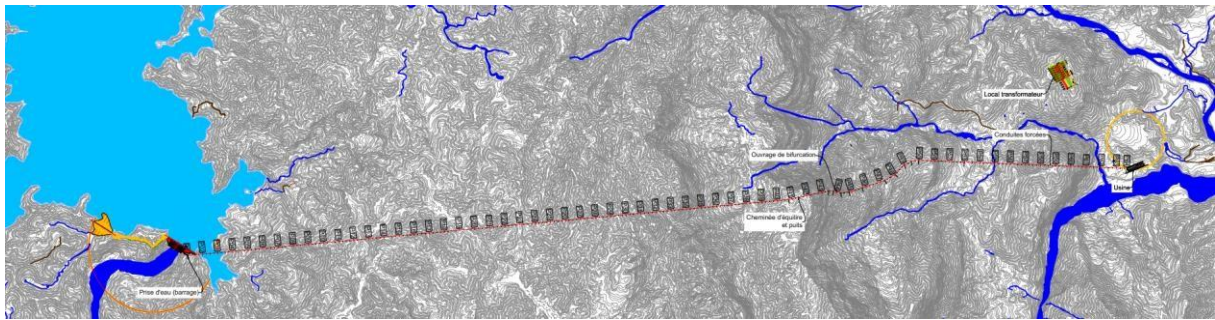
Plan view of the waterway (headrace tunnel and penstock)
